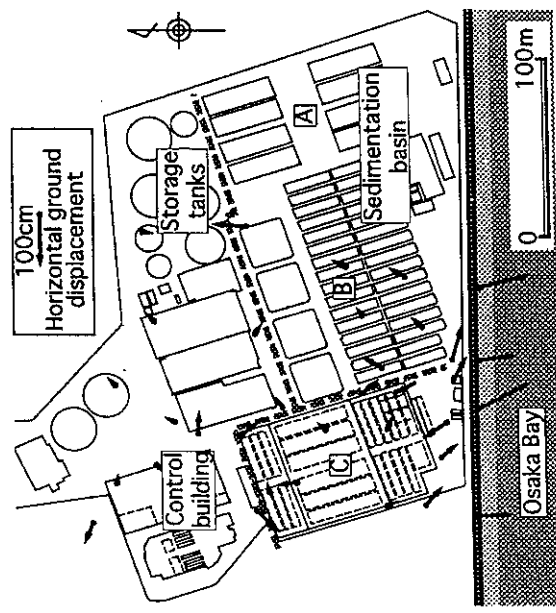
Plan of Seibu Sewage Treatment Plant and Liquefaction-Induced Ground Displacement (Hamada and Wakamatsu 1996)
